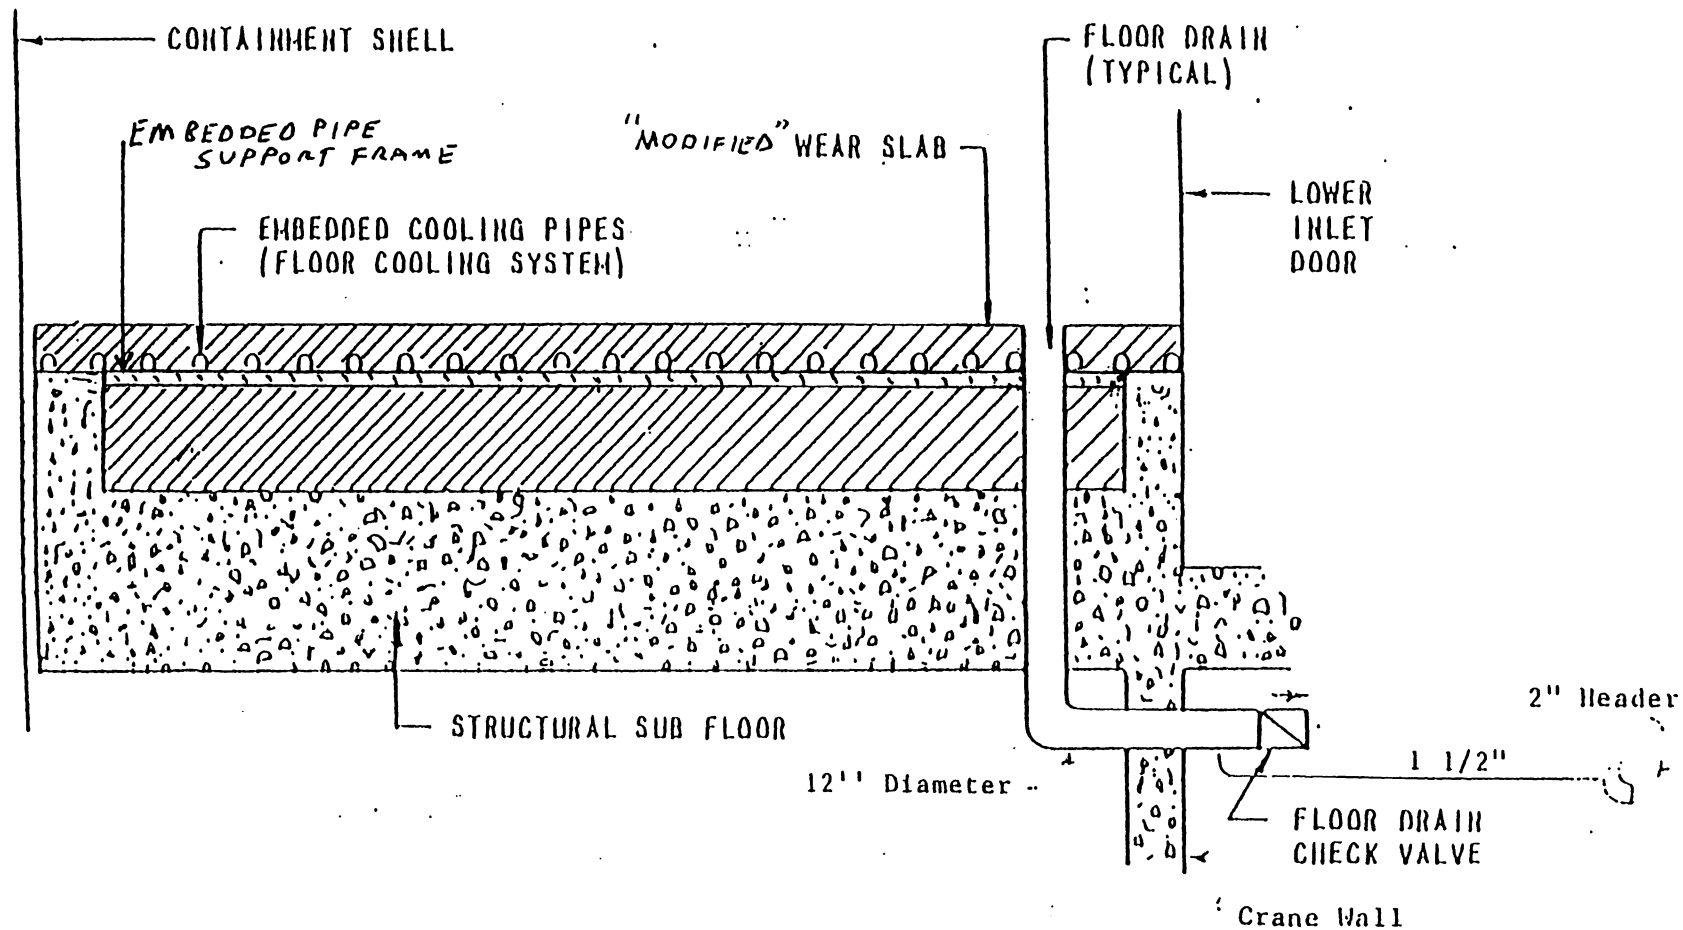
B "MODIFIED" Floor Structure
